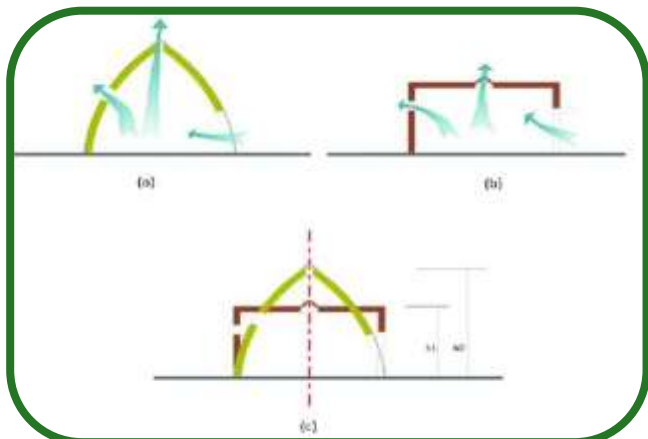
(a) Dome roof ventilation. (b) Flat roof ventilation (c) The different height from roof windows to floor with the same inner wall length
